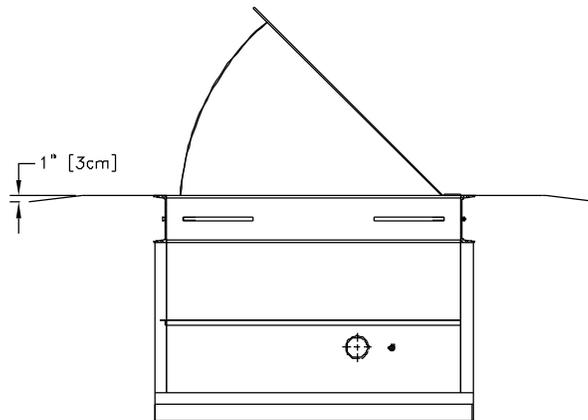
The Barriers should be placed on a crown above the surrounding roadway to prevent excessive water from draining into the Barrier foundation frame.
